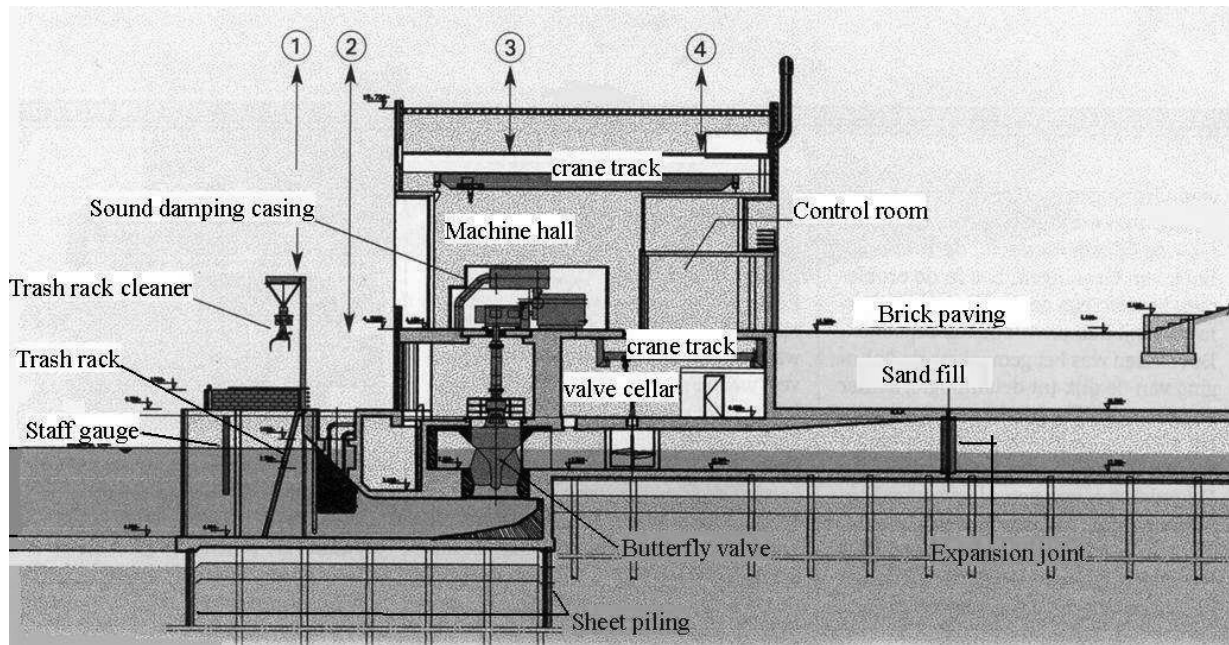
Cross section pump station Rozema and culvert through dike (partial)
